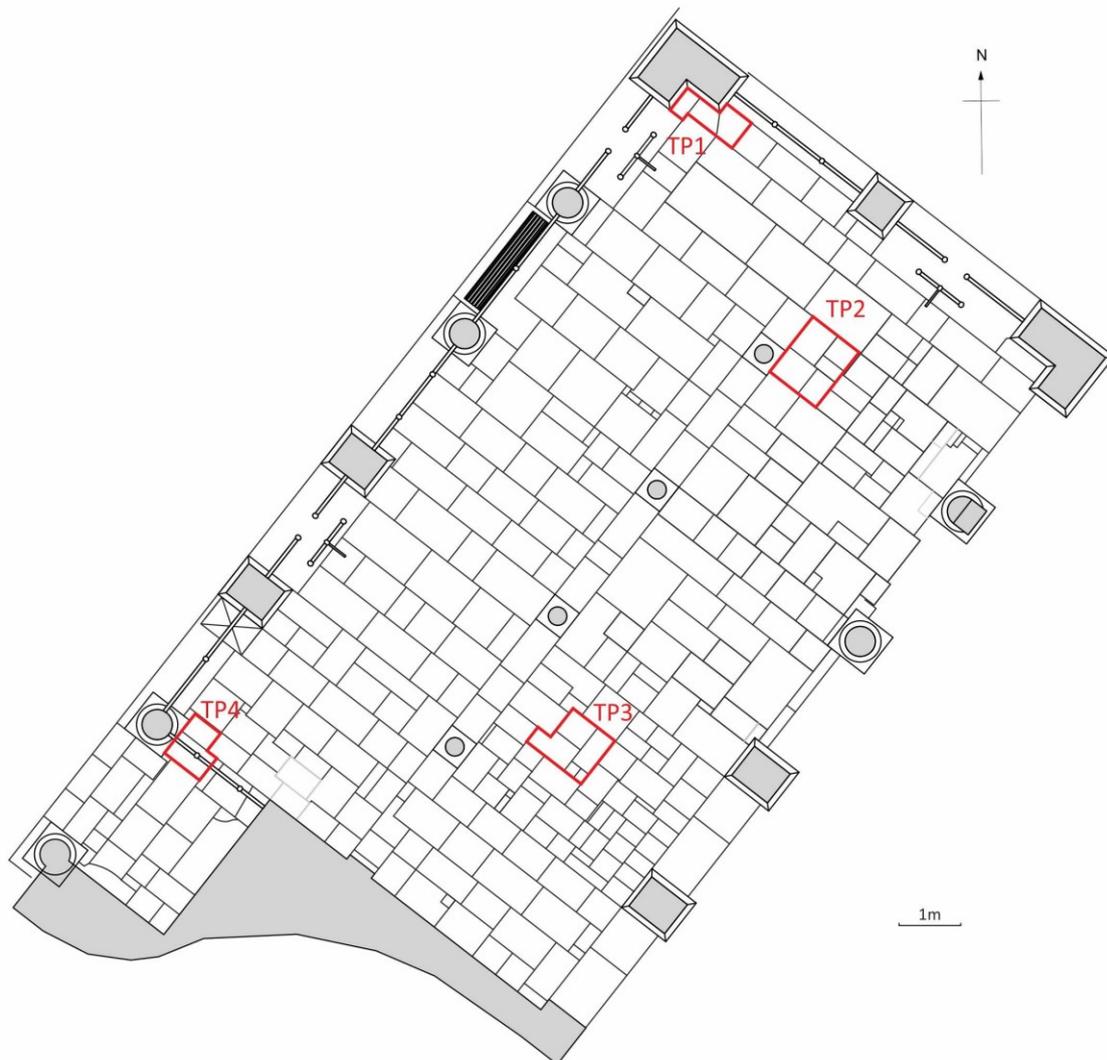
Test pit locations (after David Newton Associates Drg 265 GA02 RevA)
